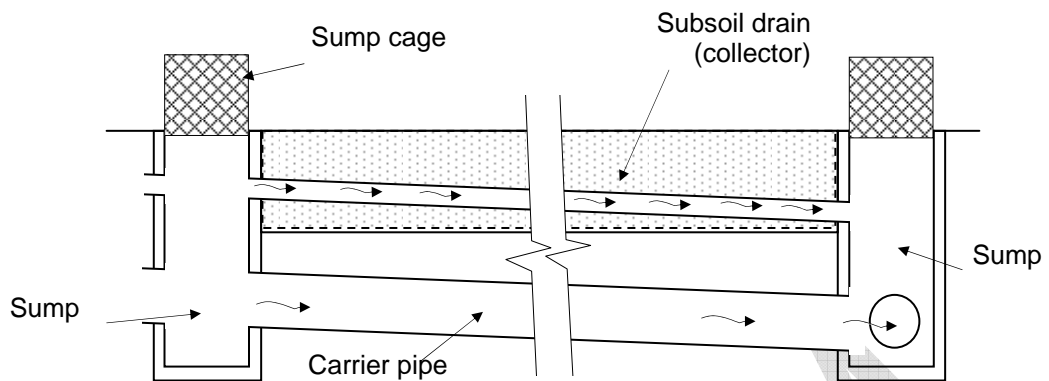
Subsoil collector drain plus a larger carrier pipe
